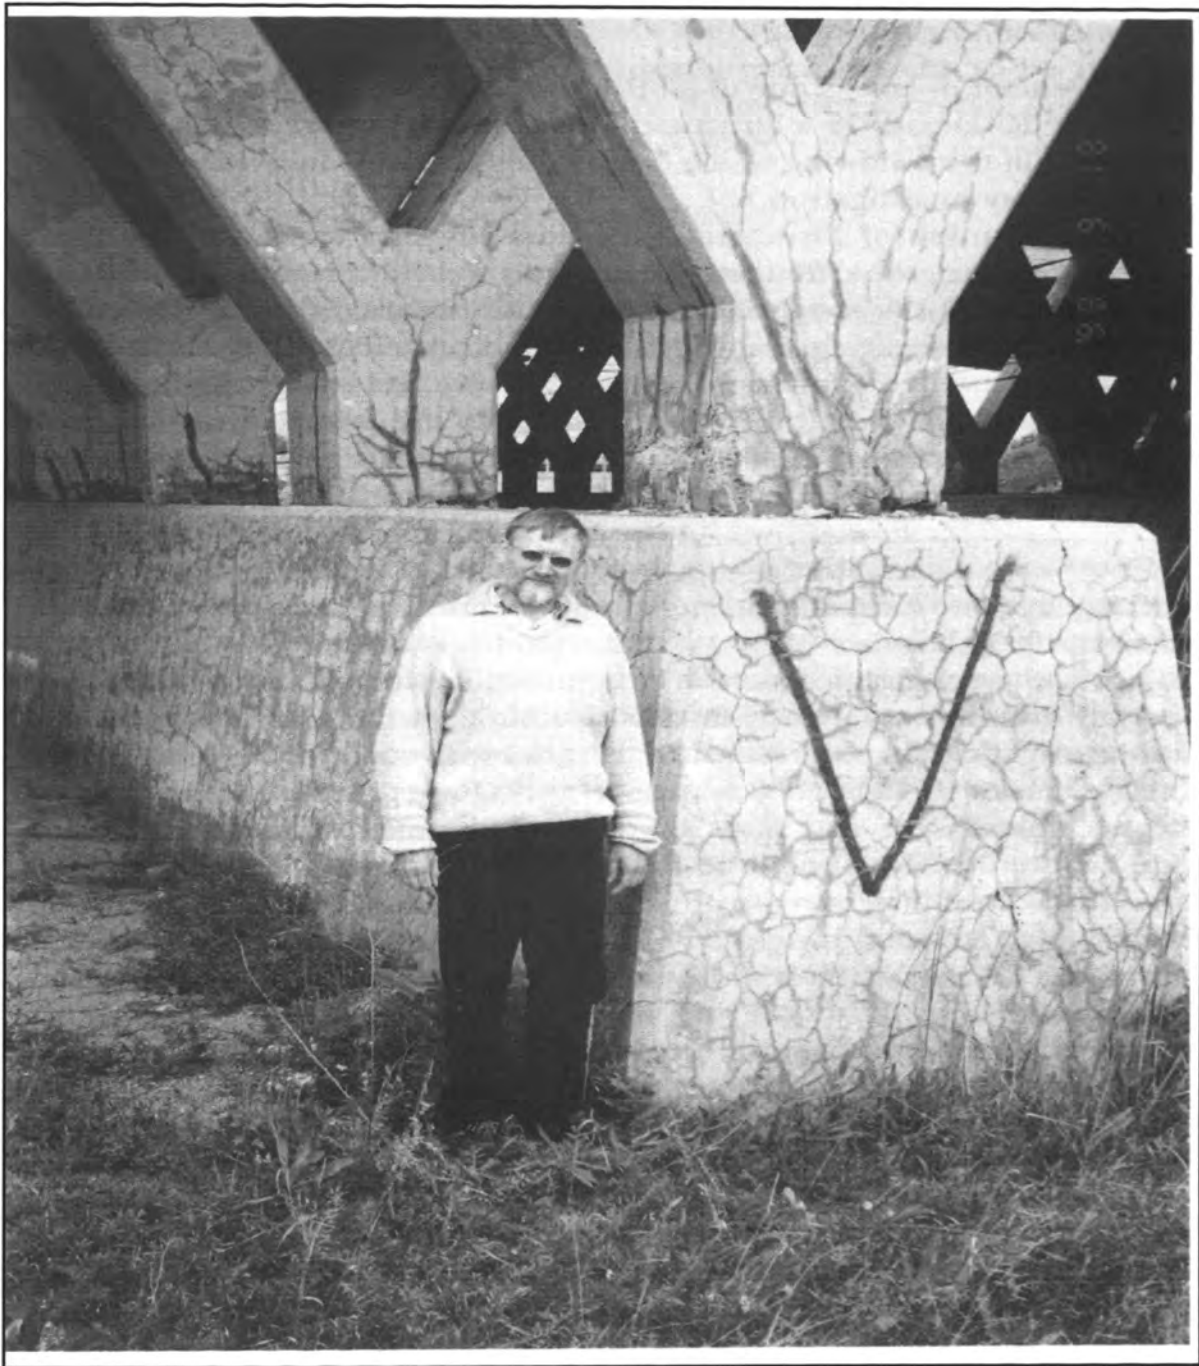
Map cracking on a bridge foundation, and Y-column in Canada (Jensen, 2005)
